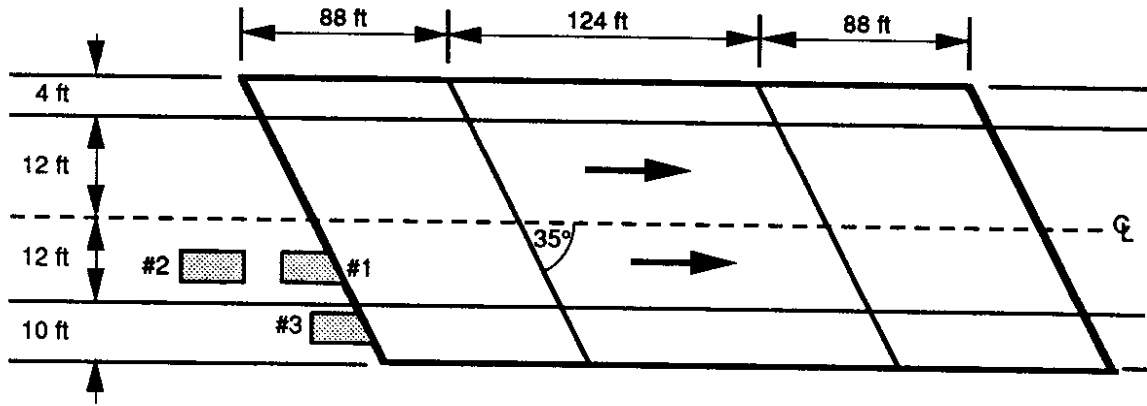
Location of Test Sections in Northbound Lanes of Sidney Road Overcrossing
